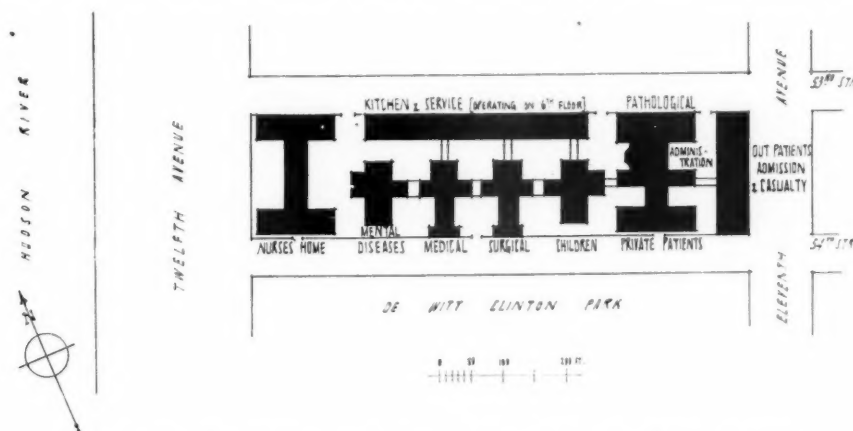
NEW YORK HOSPITAL: BLOCK PLAN. (Messrs. McKim, Mead & White, Architects.)
